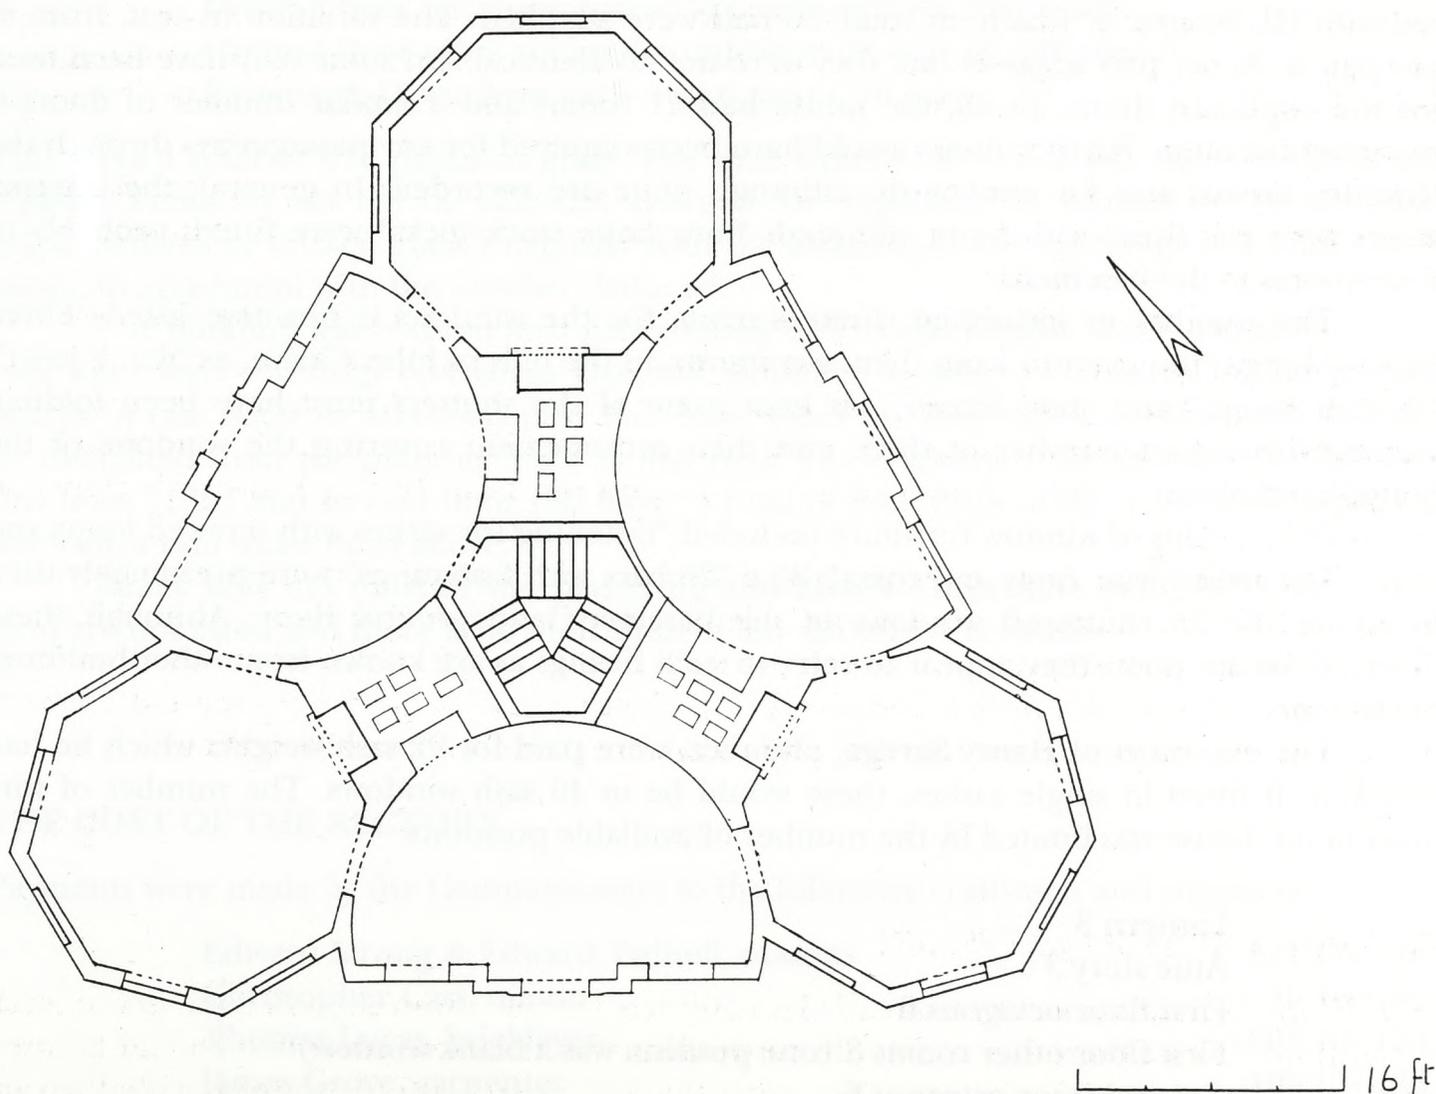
Reconstruction of the ground floor plan of the rectory.
